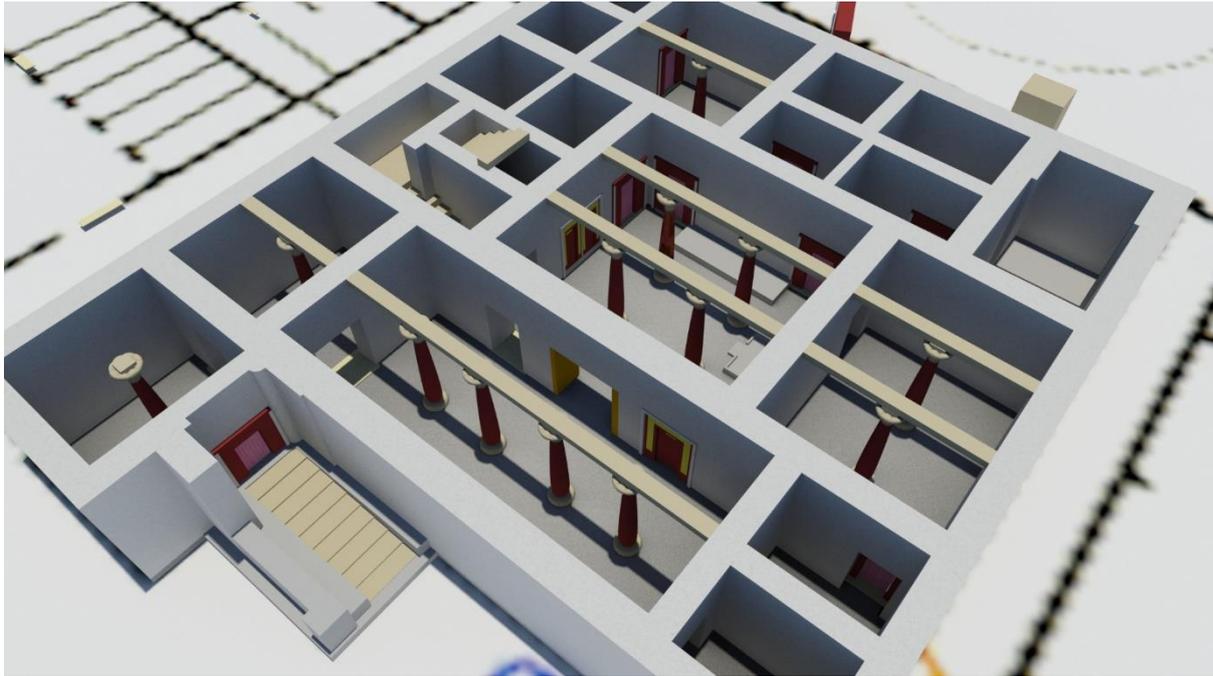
, the ground floor of the house P47.19 showing columns which could have supported an upper floor
